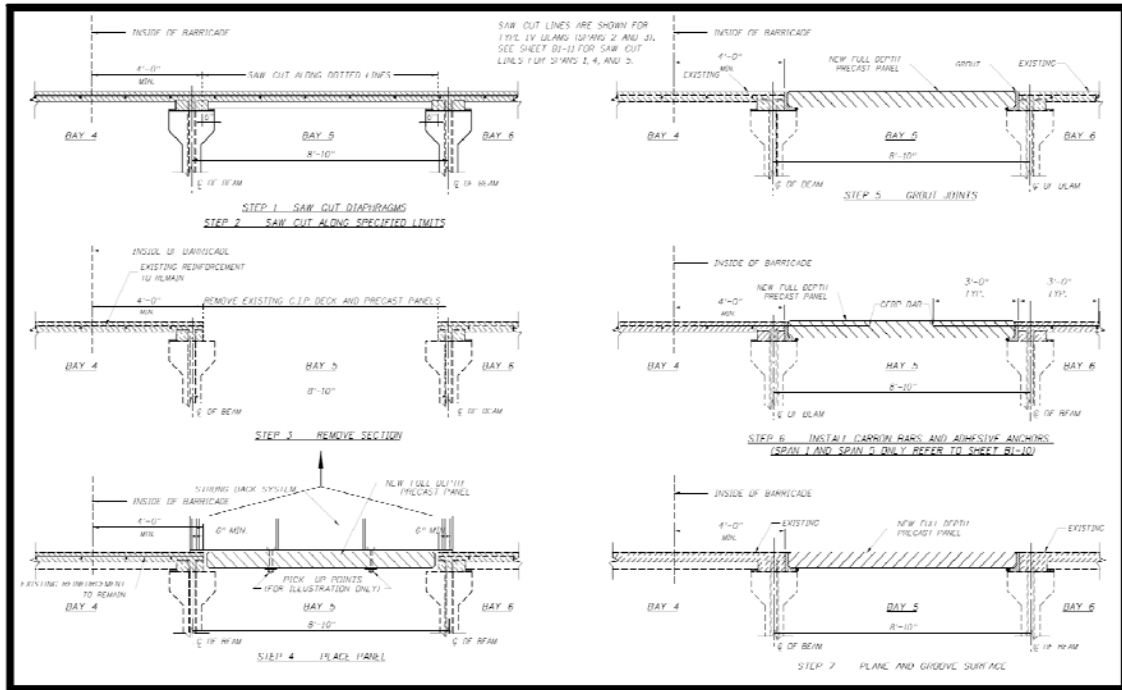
Full Depth Precast Panel Design Plan Details [25]
